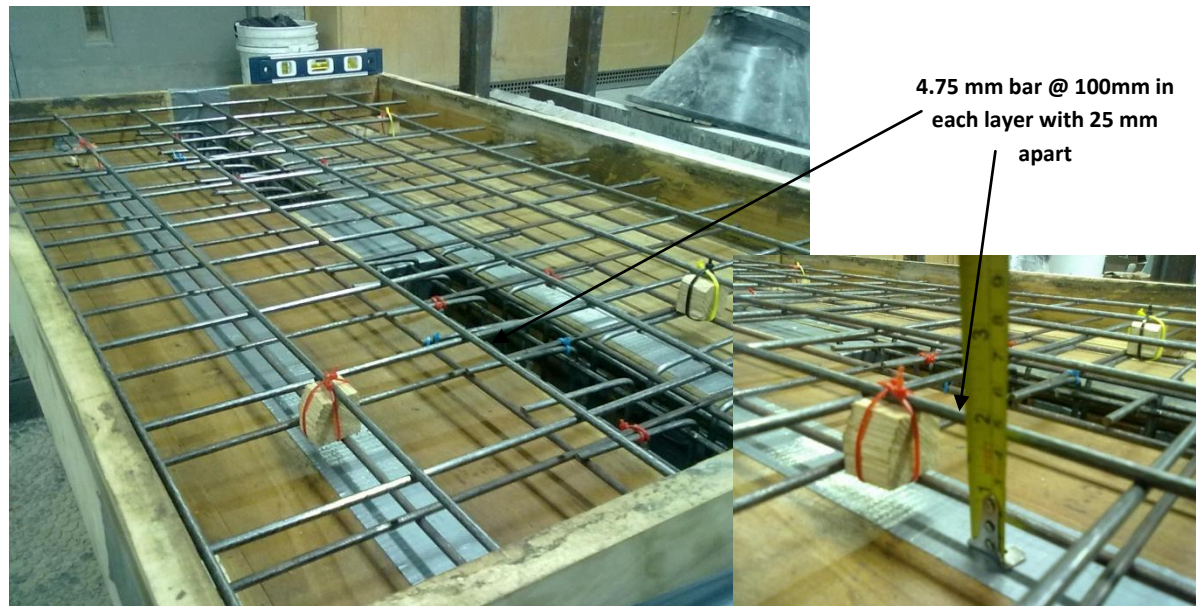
Formwork/mould ready with steel reinforcements for casting CSW model specimens
